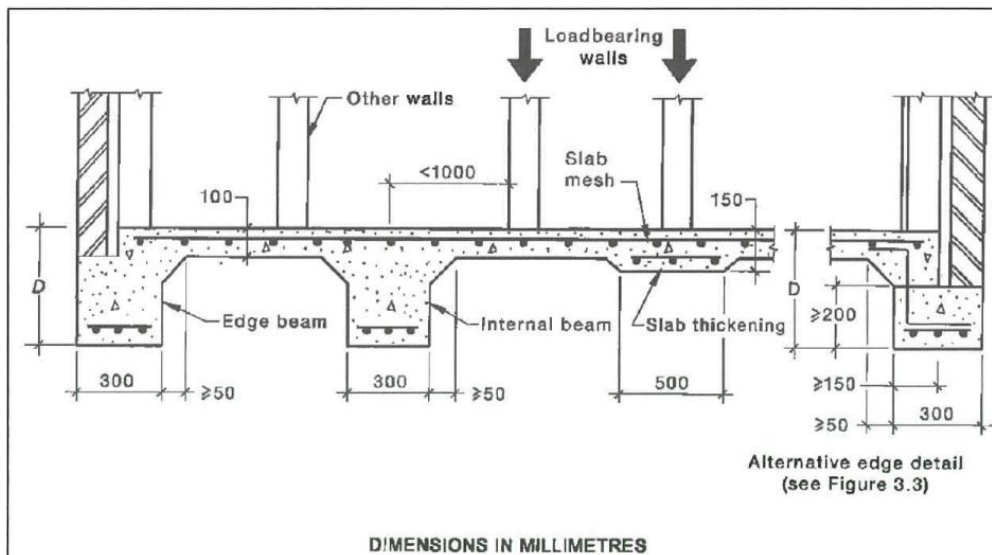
Example of a stiffened slab (Figure 3.1 from AS2870 (2011))¹¹
